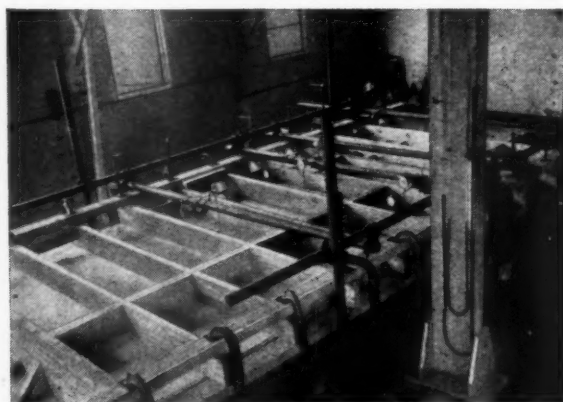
Rig for static loading tests. (Floor section is inverted, with captive airbag beneath for loading.)
